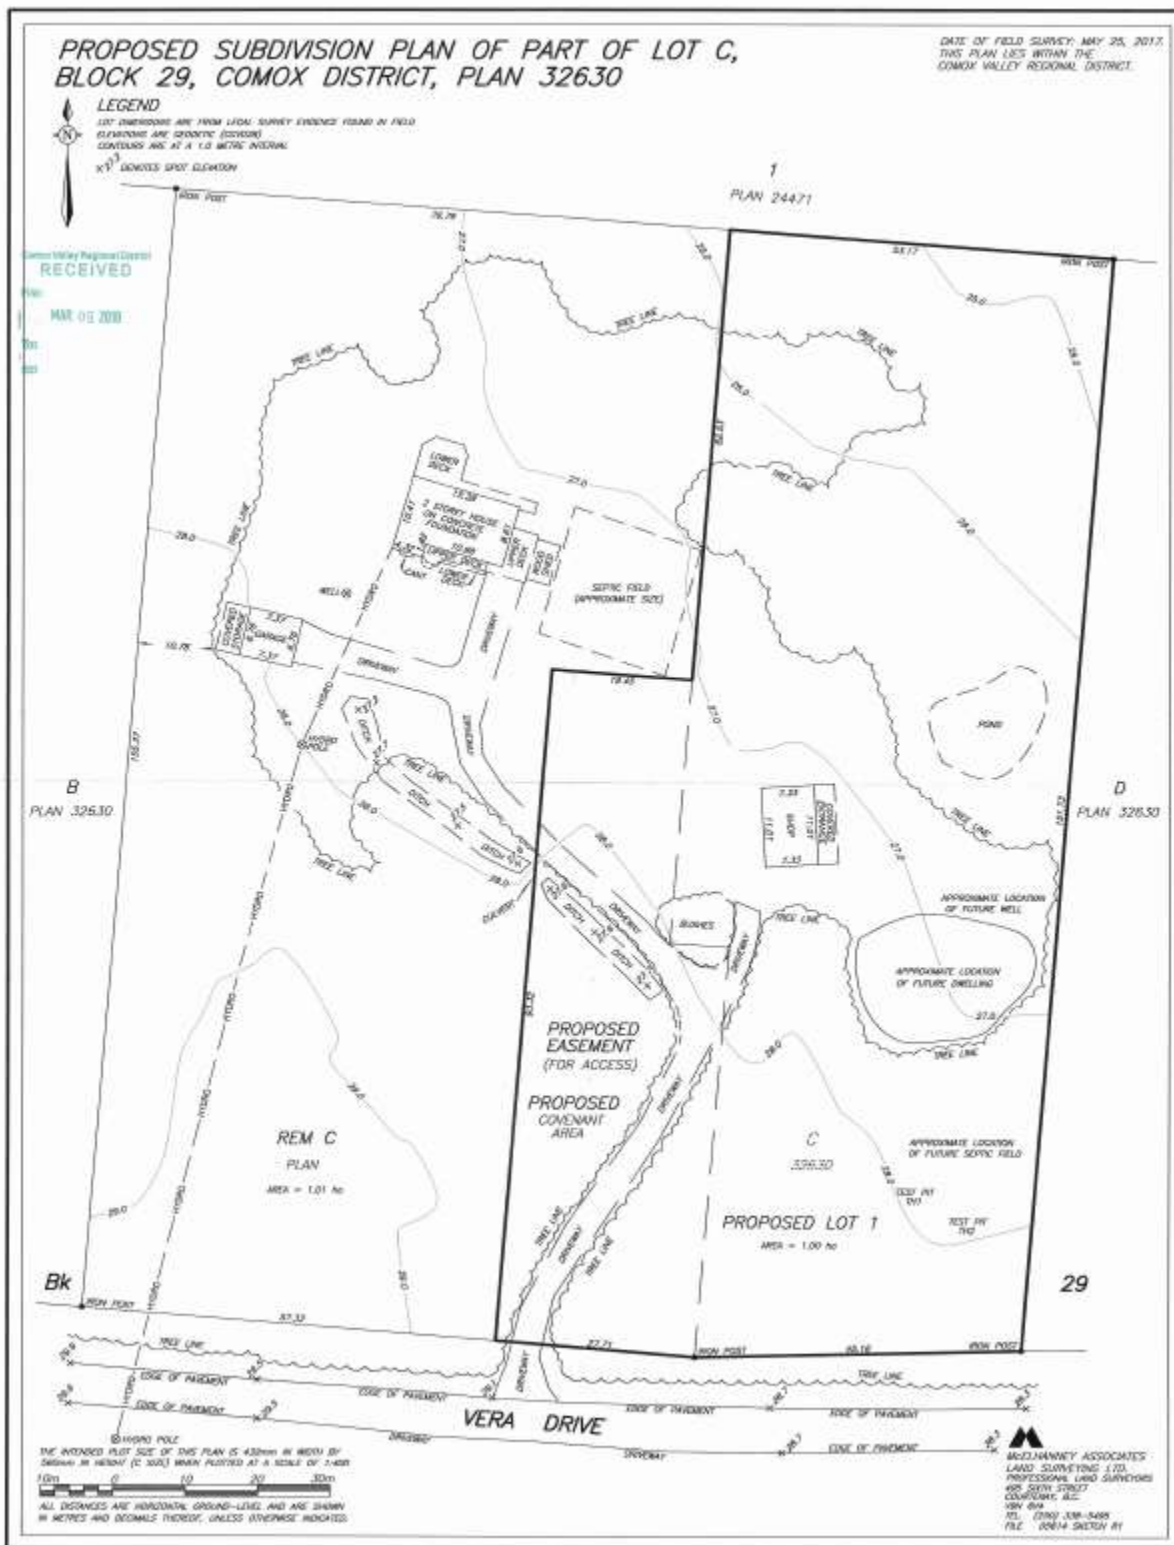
Proposed Subdivision Plan if Rezoning were to be Successful
